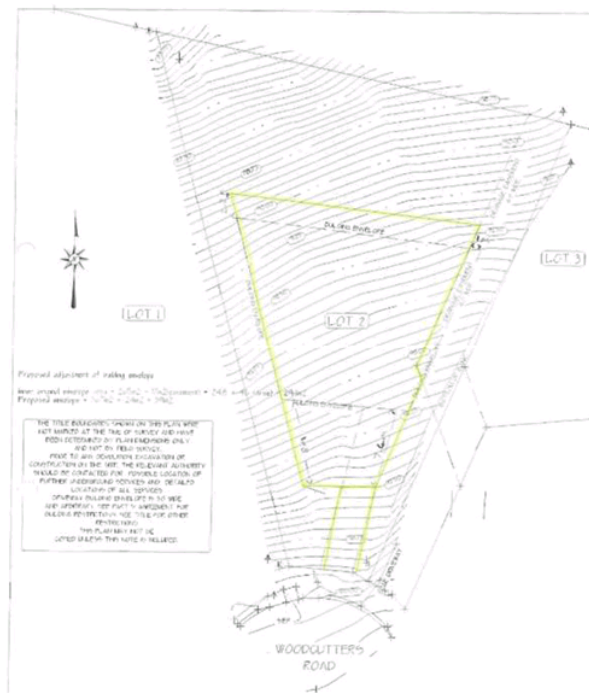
amended (current) building envelope shown on lot 2 Stage 5 THLAP
